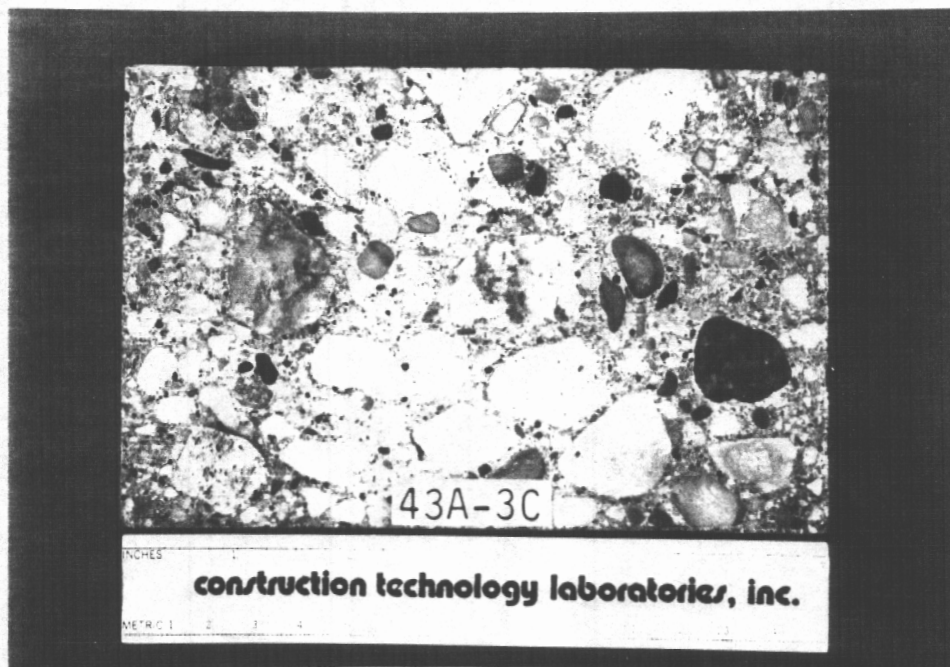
LAPPED SLICE SIDE OF CONCRETE SPECIMEN NO. 43A-3C.
